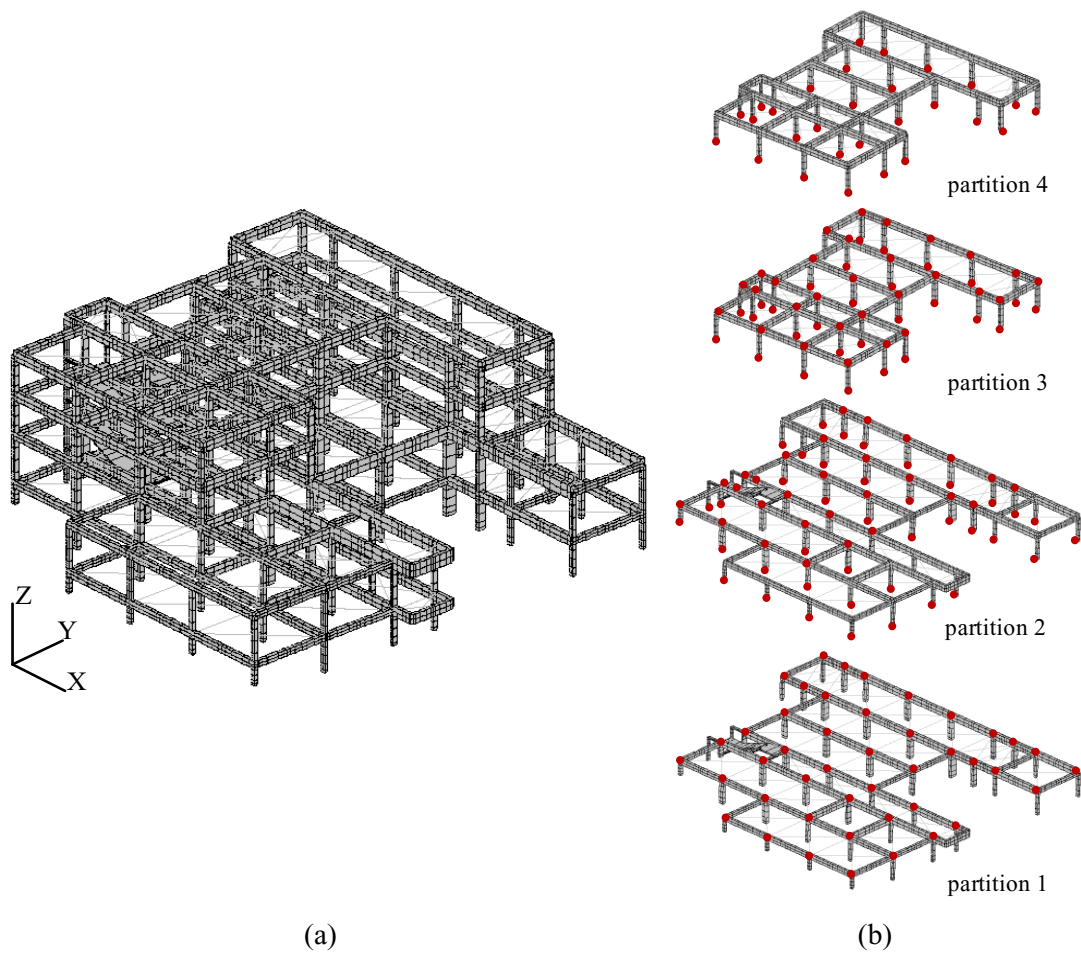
Finite element model of the 3D RC building: (a) bare frame model; (b) illustration of portioned floors
